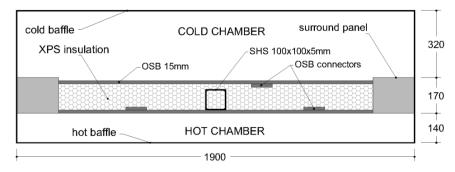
Cross-section of tested specimen, inserted in hot box (dimensions in mm).
